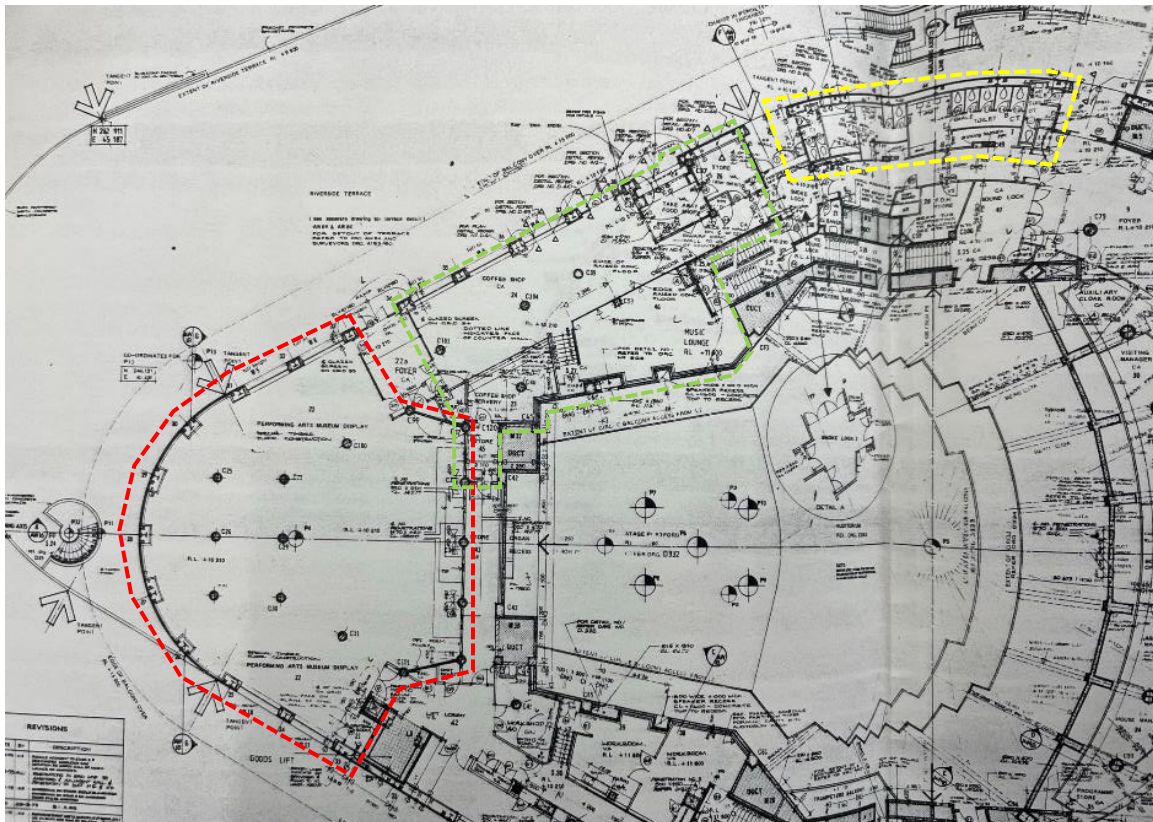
Early floor plan of Hamer Hall St Kilda Road Level (Level 06) showing original internal layout. PAM indicated in red, Treble Clef restaurant and kiosk indicated in green, and toilets indicated in yellow. Source: PROV 7882/P0001.
